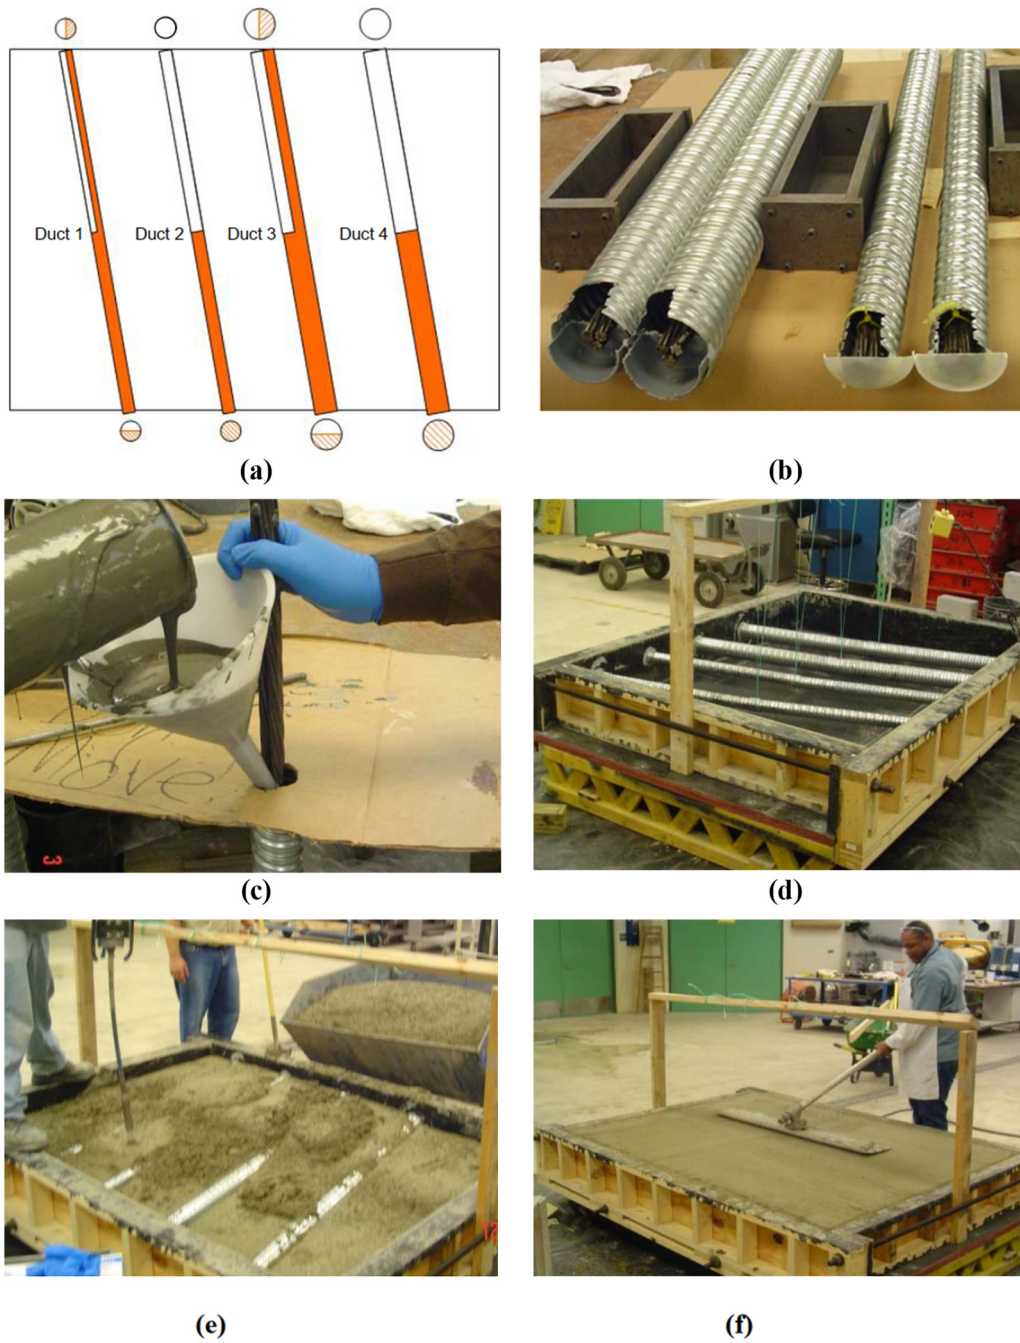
Slab 7: (a) schematic design, (b) preparing duct, (c) filling the grout, (d) installing the ducts in formwork, (e) concrete placement, (f) finishing the concrete surface [46].
